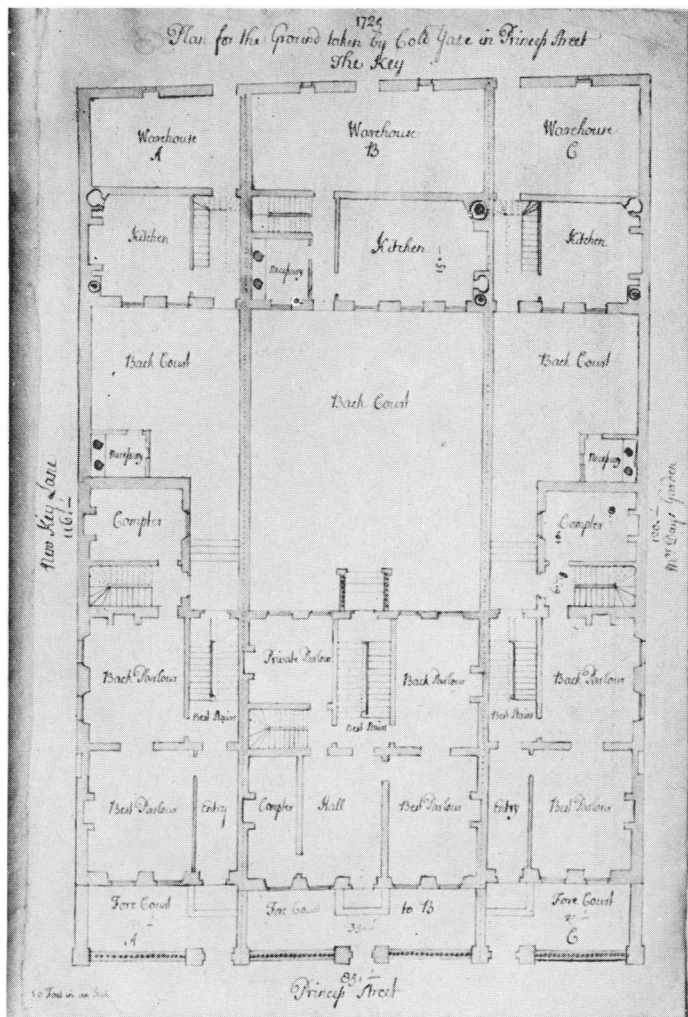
Plan of Colonel Yate's site in Prince Street, Bristol [96]
